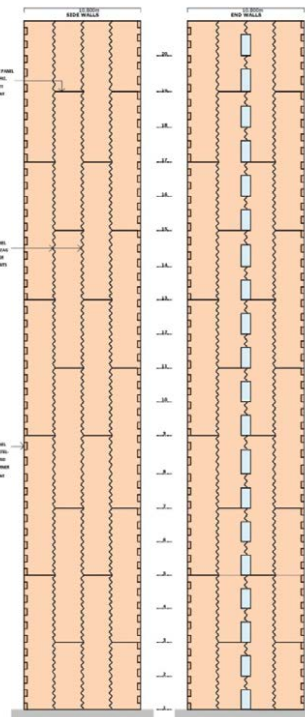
Twenty level Integrated Panel Core - Side and End Elevations
